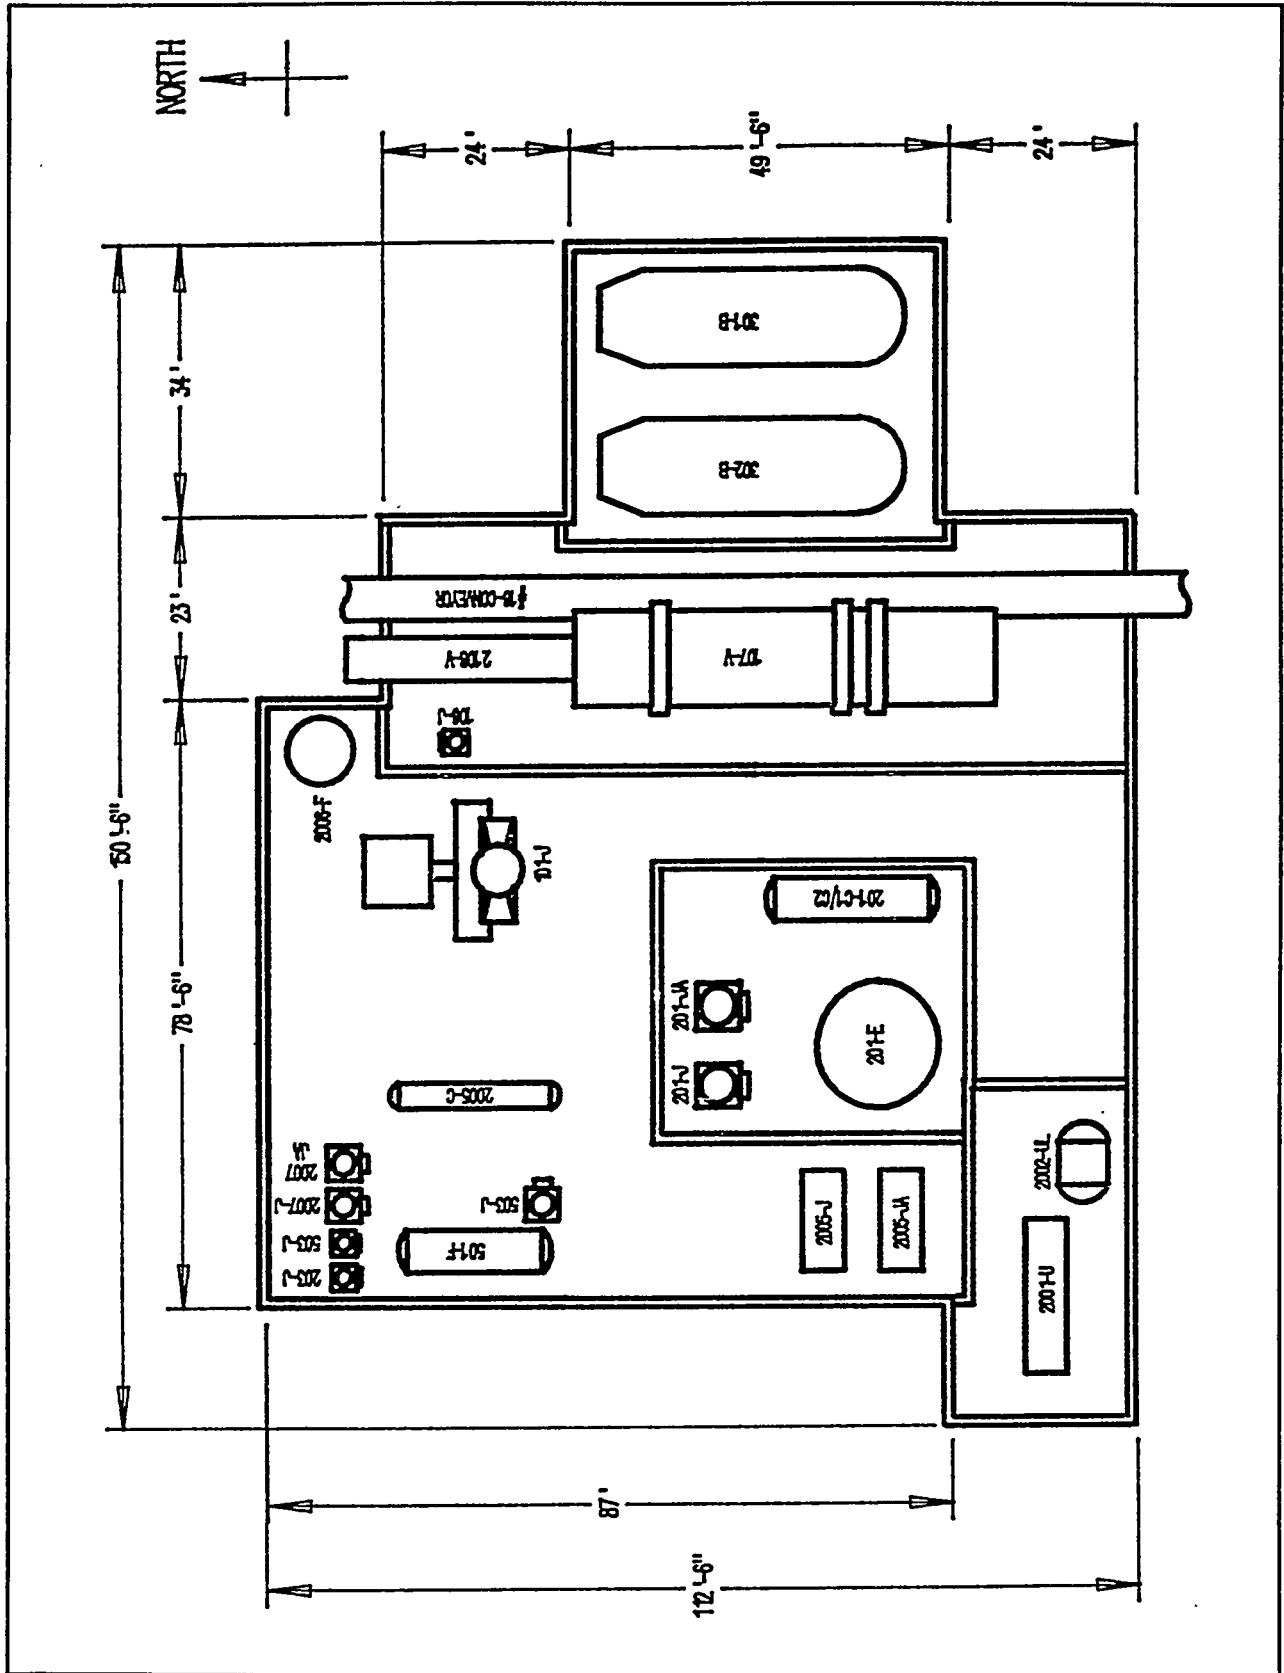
PDF Structure Floor Plan (Elevation 100'-6")
